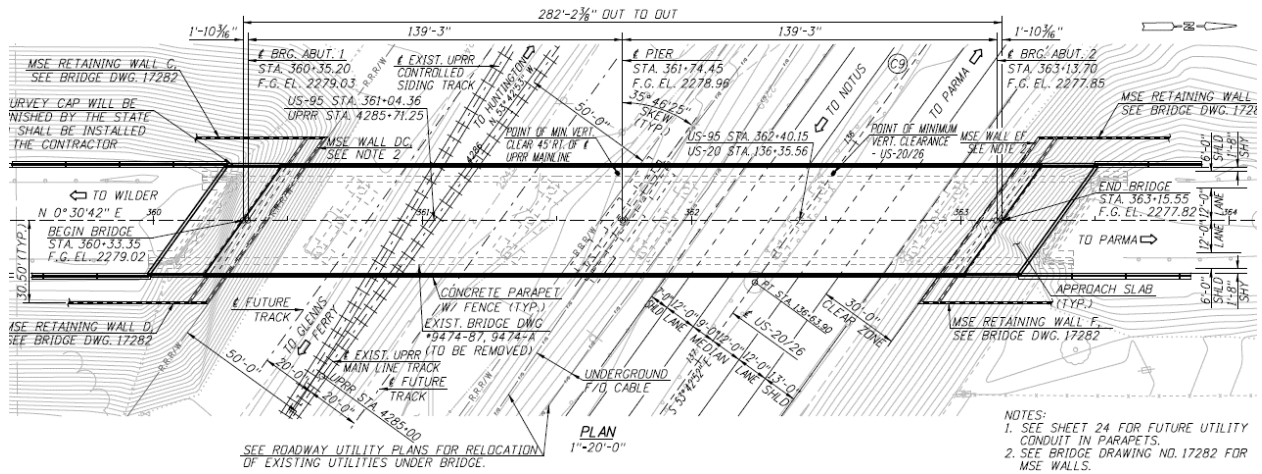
Plan View of US-95 over US-20/26 and UPRR at Parma (NTS)
